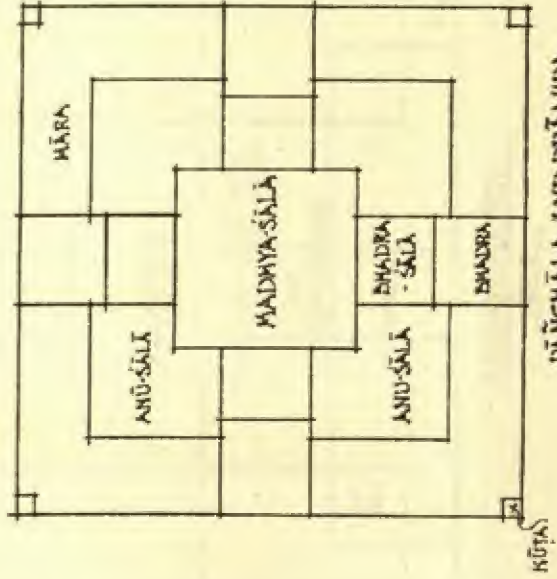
INTERMEDIATE SIZE — 34 PARTS
